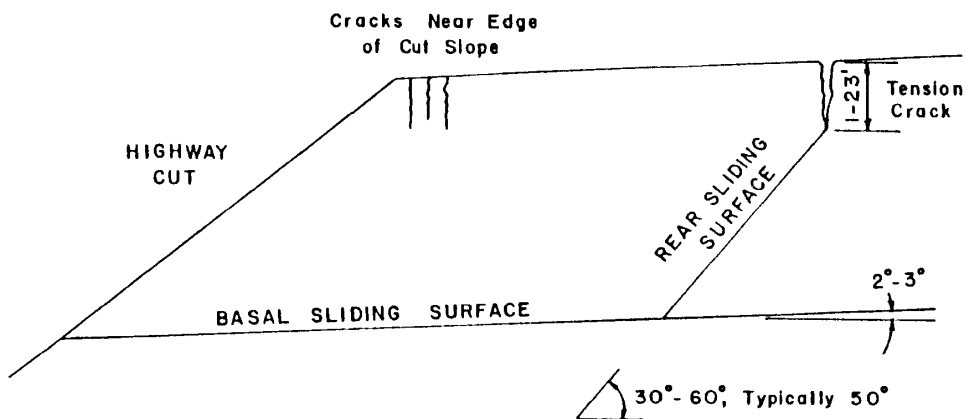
Schematic cross section of typical failure mass. (Hamel & Flint, 1972)
